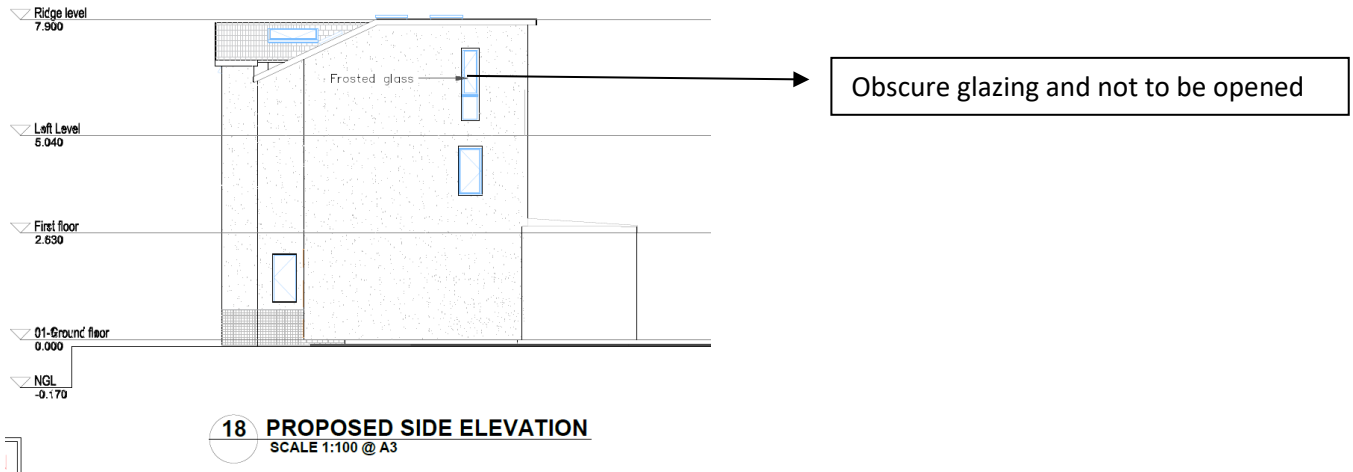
Side elevation with obscure glazing and non-opening window below 1.7 m
